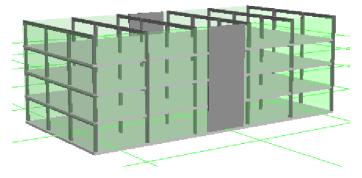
Six moment frames, each of three bays, resist shaking across the building, and two structural walls resist shaking in the direction along the length of the building. (The roof slab is not shown.)
